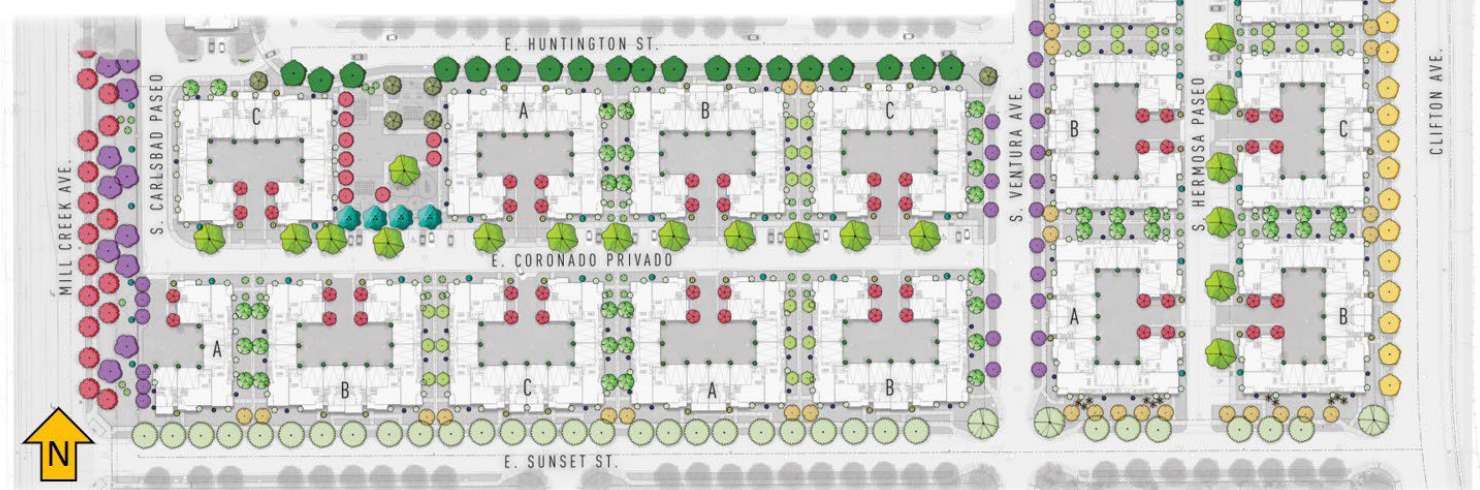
TYPICAL ROW TOWNHOMES PAVING LAYOUT
